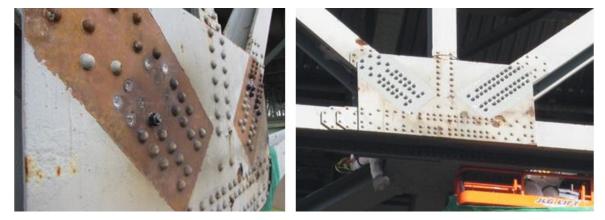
Example of Gusset Plate Repair. Rivet Removal (left) and Replacement with HS Bolts (right)
